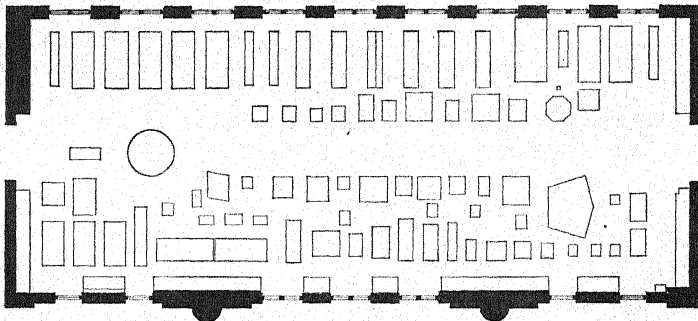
American Museum of Natural History. Floor plan of the Mexican hall.
